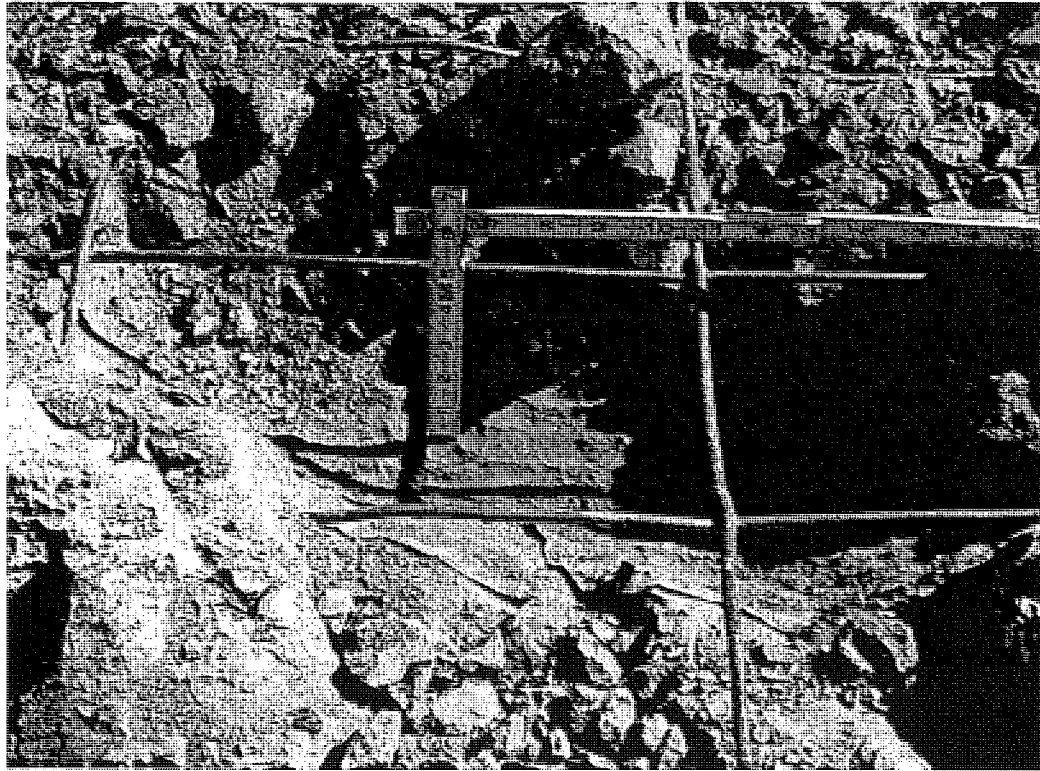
Excavated trench in a rubblized concrete slab showing the sand subbase and the fractured concrete
